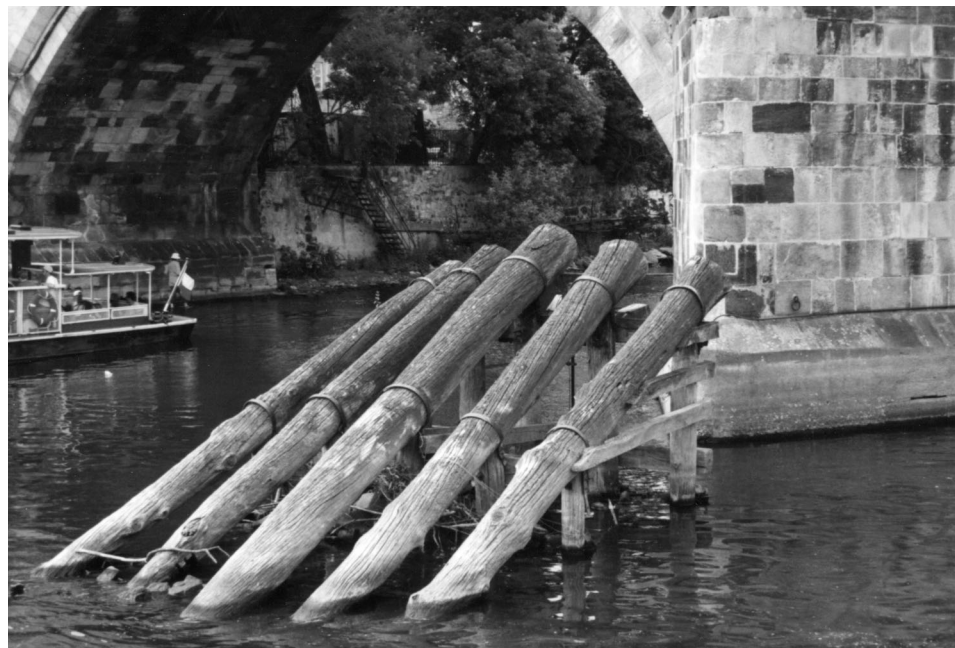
Debris/ice deflector upstream of a bridge pier
